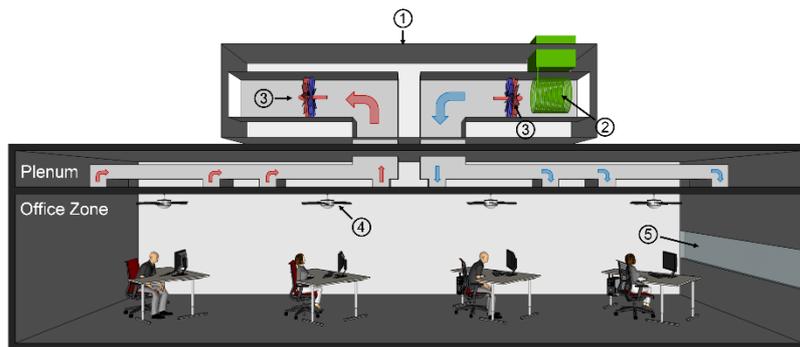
HVAC layout: (1) Rooftop air handling unit; (2) Heat pump and heat exchanger; (3) Fans; (4) Ceiling fan; (5) Window
